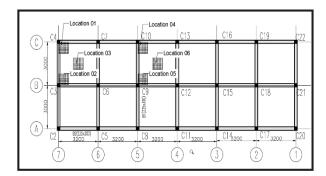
Locations of the Tower Considered for Analytical Study in Plan View
